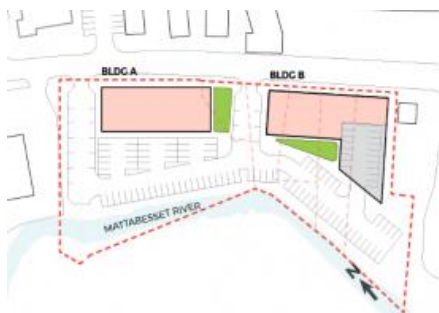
Berlin Station Test-Fit Ground Floor Plan
